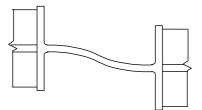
'Column-sway' buckling mode of an unstiffened web
